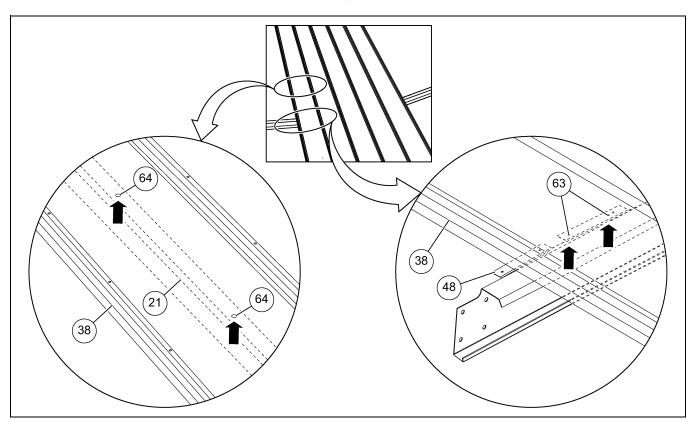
W Installing the Roof Panels to the Roof Panel Support Clips and Roof Rafters
